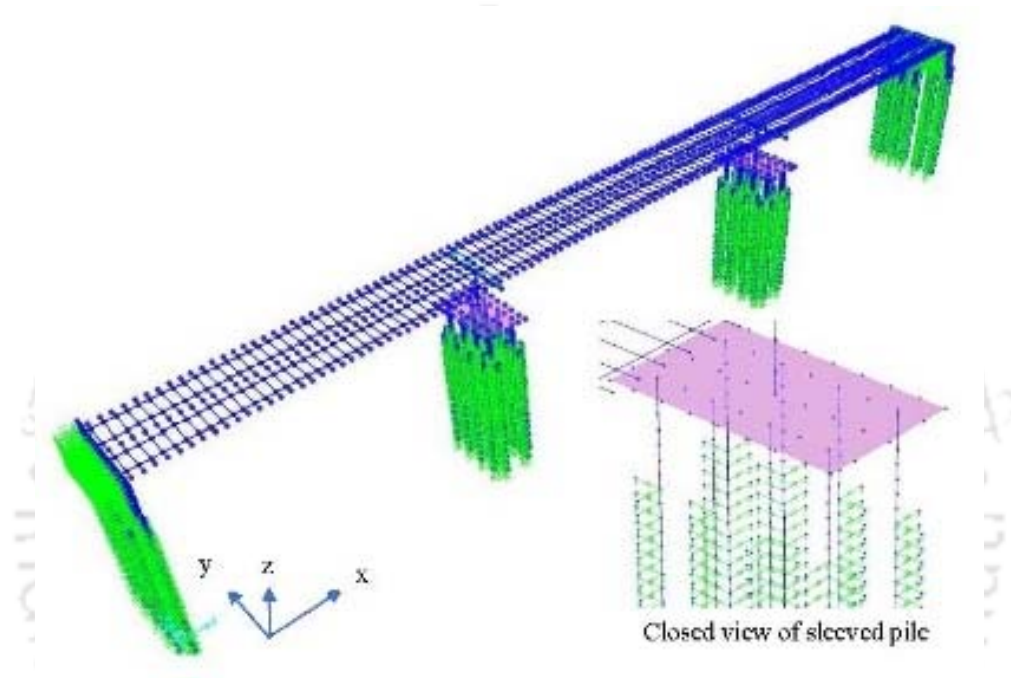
Model-1 Concrete pile in abutment and sleeved pile in pier foundation
